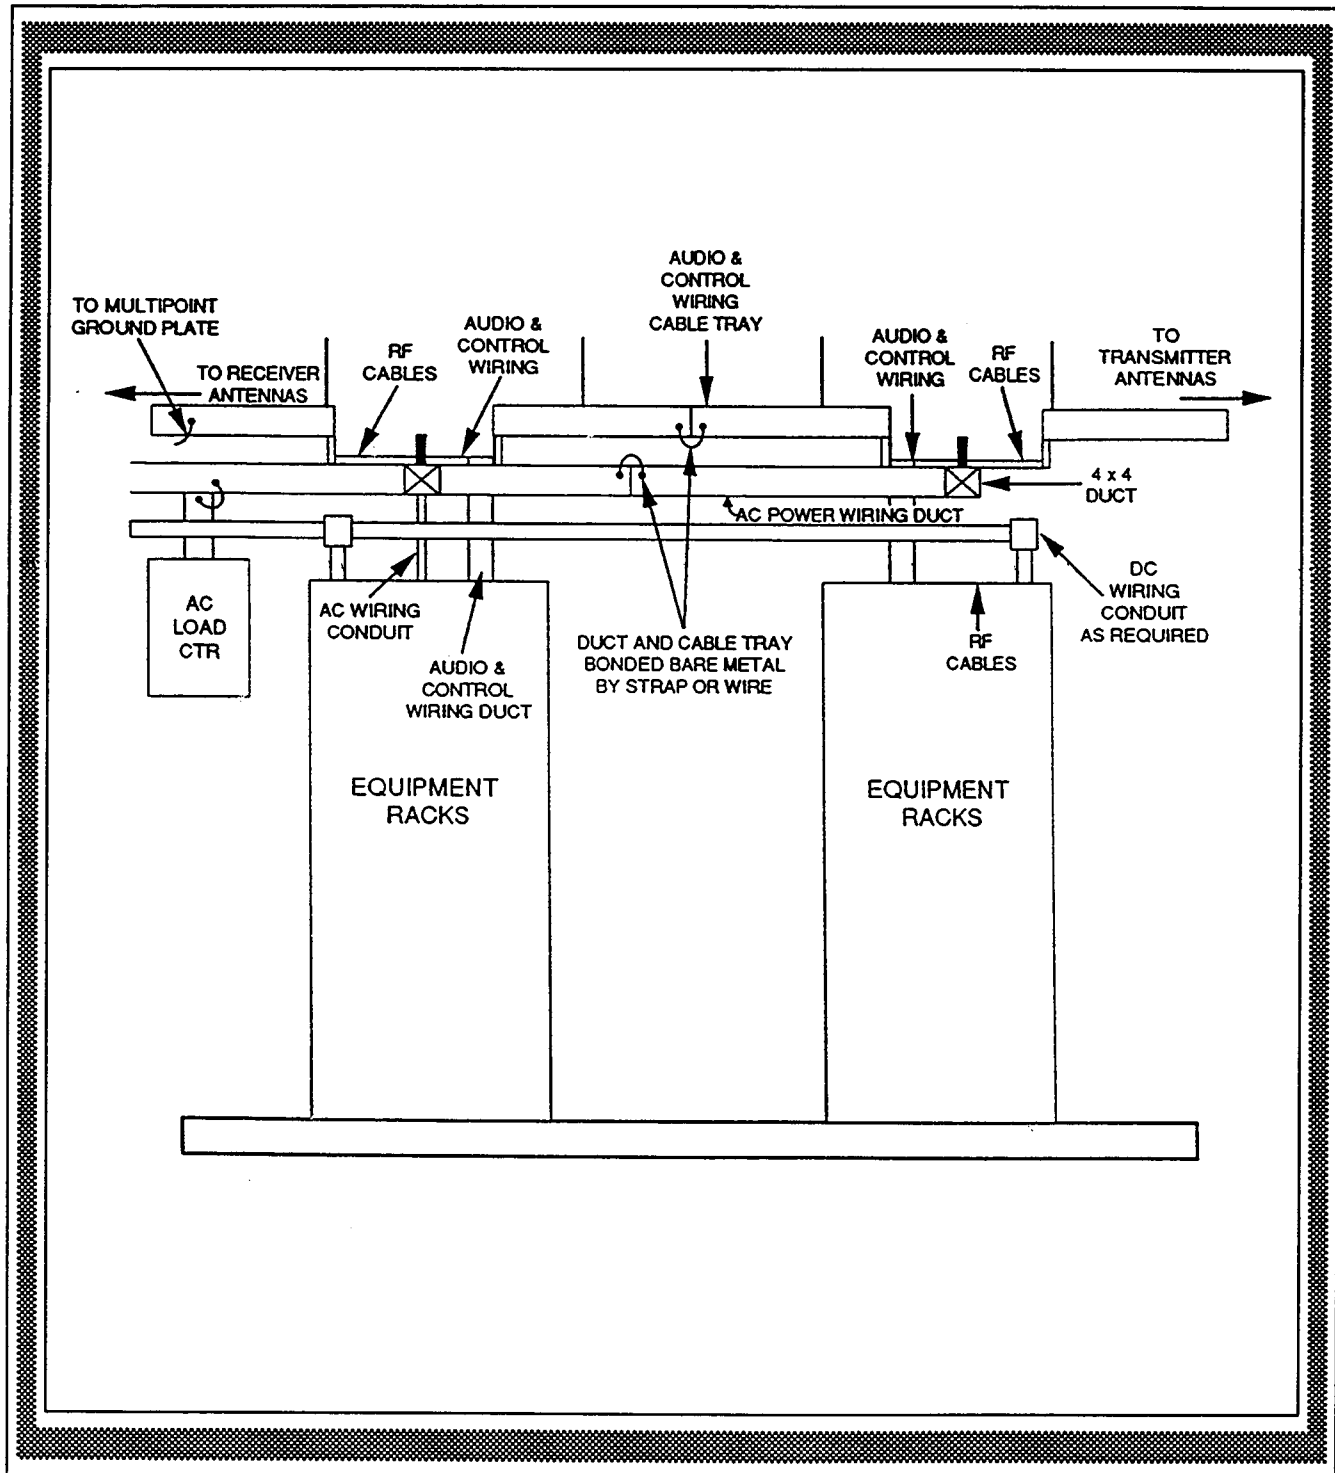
TYPICAL RCF CABLE TRAY INSTALLATION, TOP VIEW
